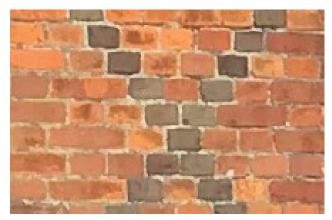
Red brick with with blue diaper work detail of the Village Hall facade
